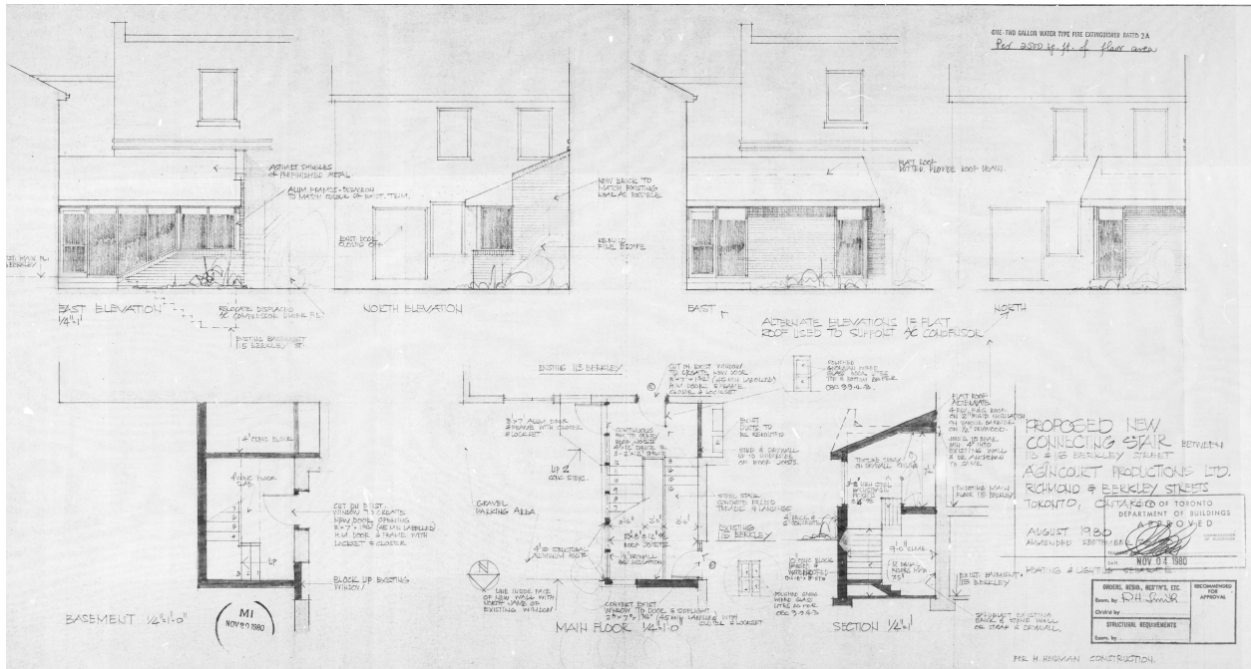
1980 drawing for the single-storey, enclosed stair connecting the rear of 111 and 115 Berkeley Street (Building Records)
